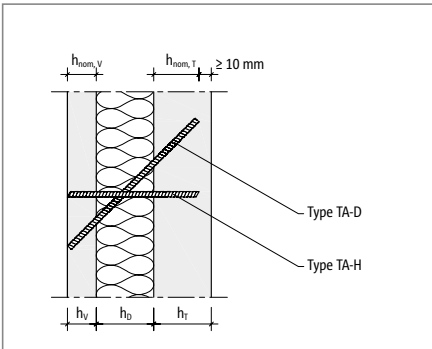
Schöck Isolink® type TA-H, TA-D: Cross-section details for the sandwich wall;  $h_{nom,V} = h_v$
